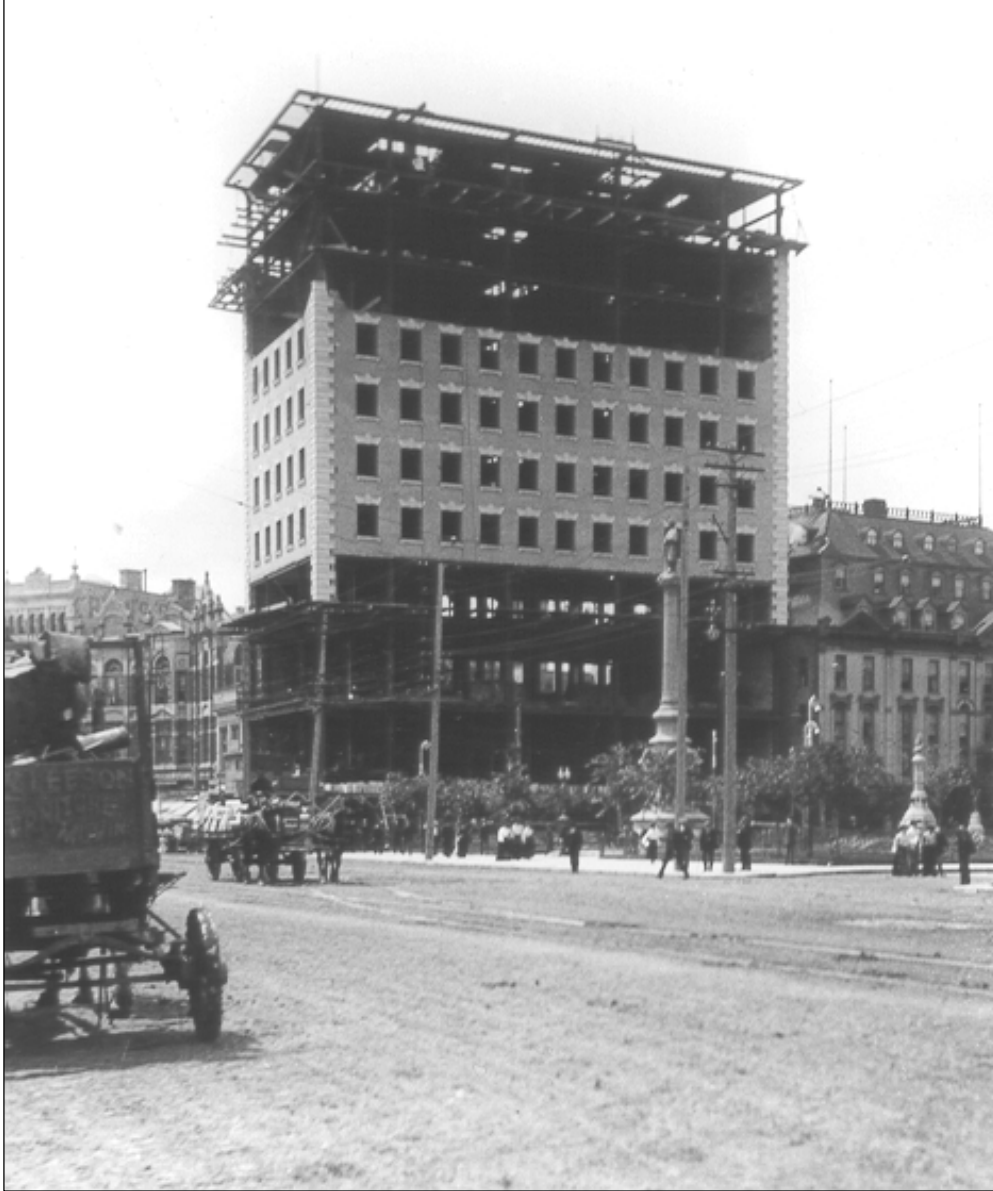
Union Tower, 504 Main Street, during construction, 1904. Note the steel support system on the upper floor. (Courtesy of the Provincial Archives of Manitoba, Ernest Crocker Collection, #24.)
